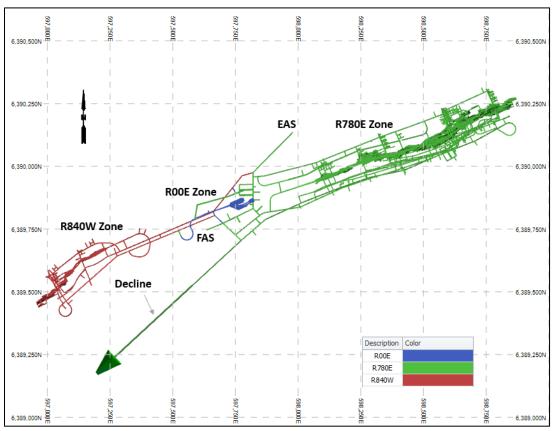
and Figure 16-14 show a longitudinal section and plan view of the mine plan with the three main zones and the associated mine access development.
